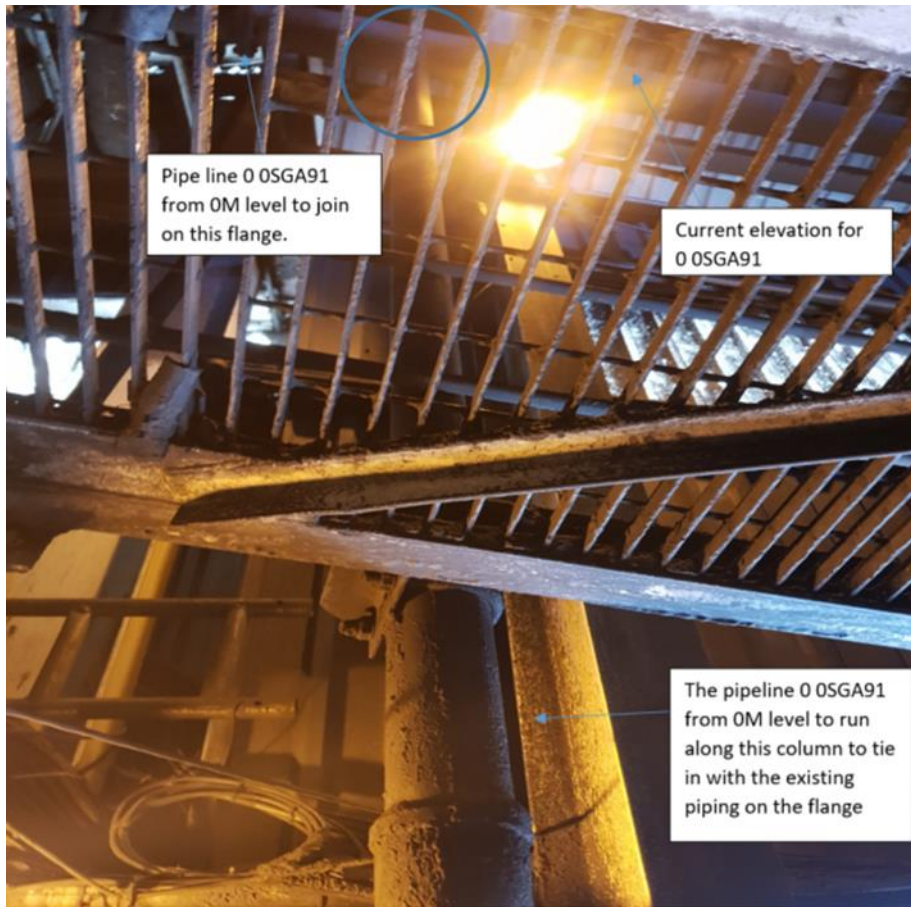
Existing Fire reticulation to be re-routed at Sizing Complex.
